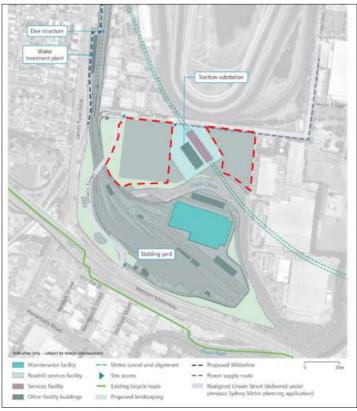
EIS 3 - Indicative layout plan of Clyde stabling
